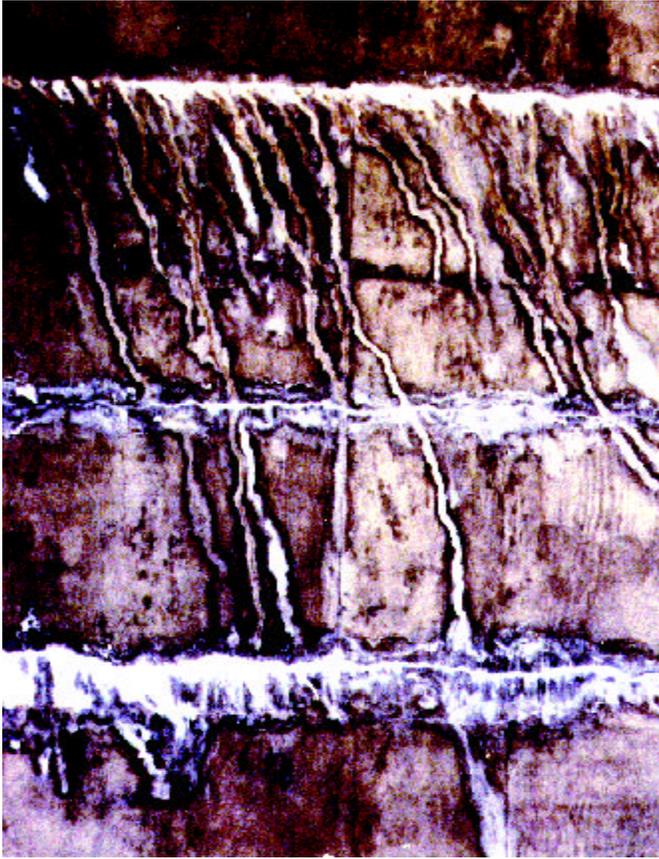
Photograph of early-age cracking in the high-performance concrete used in the construction of the new 23rd Street Viaduct in Denver, Colo.
